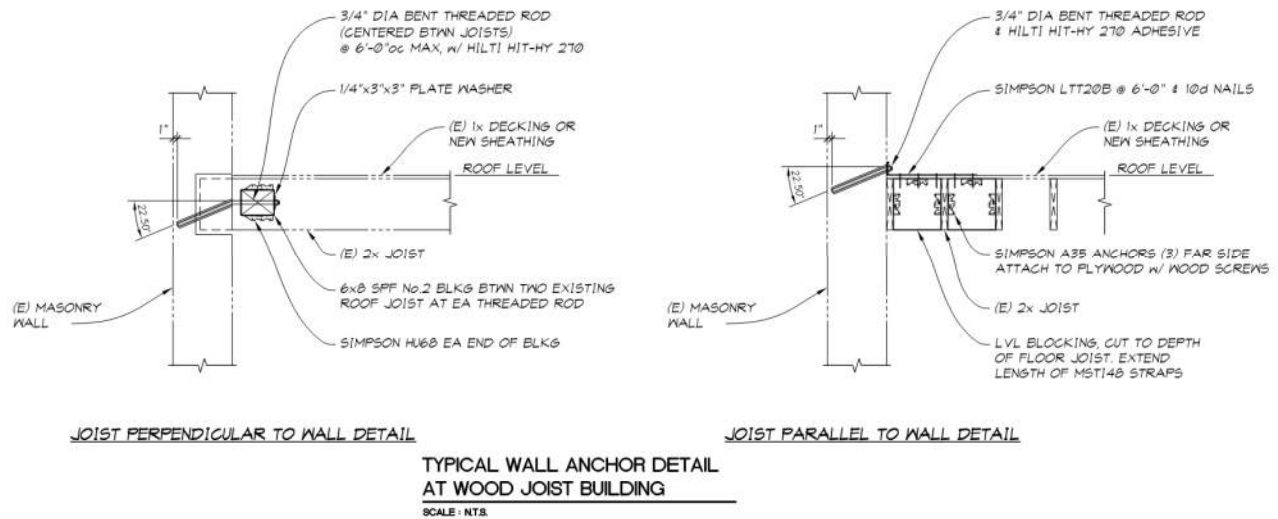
South Building Wall to Level 2 Floor Anchorage – IEBC 2021 (section 906.4) Compliance Detail
